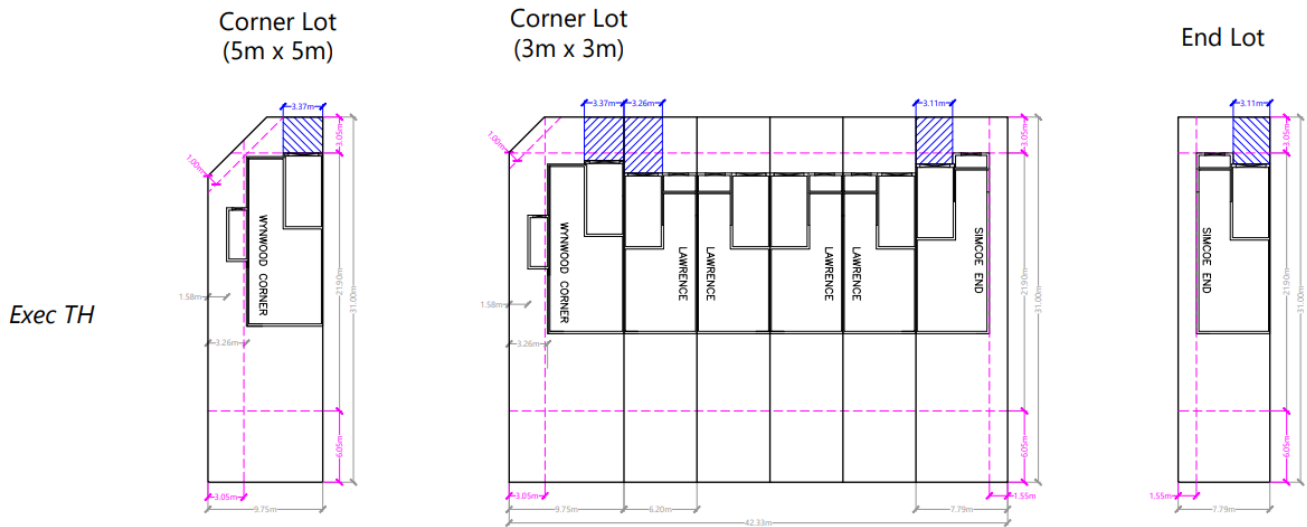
Conceptual Site Plan Layouts for townhouse dwellings. House footprints, outlined in black.
